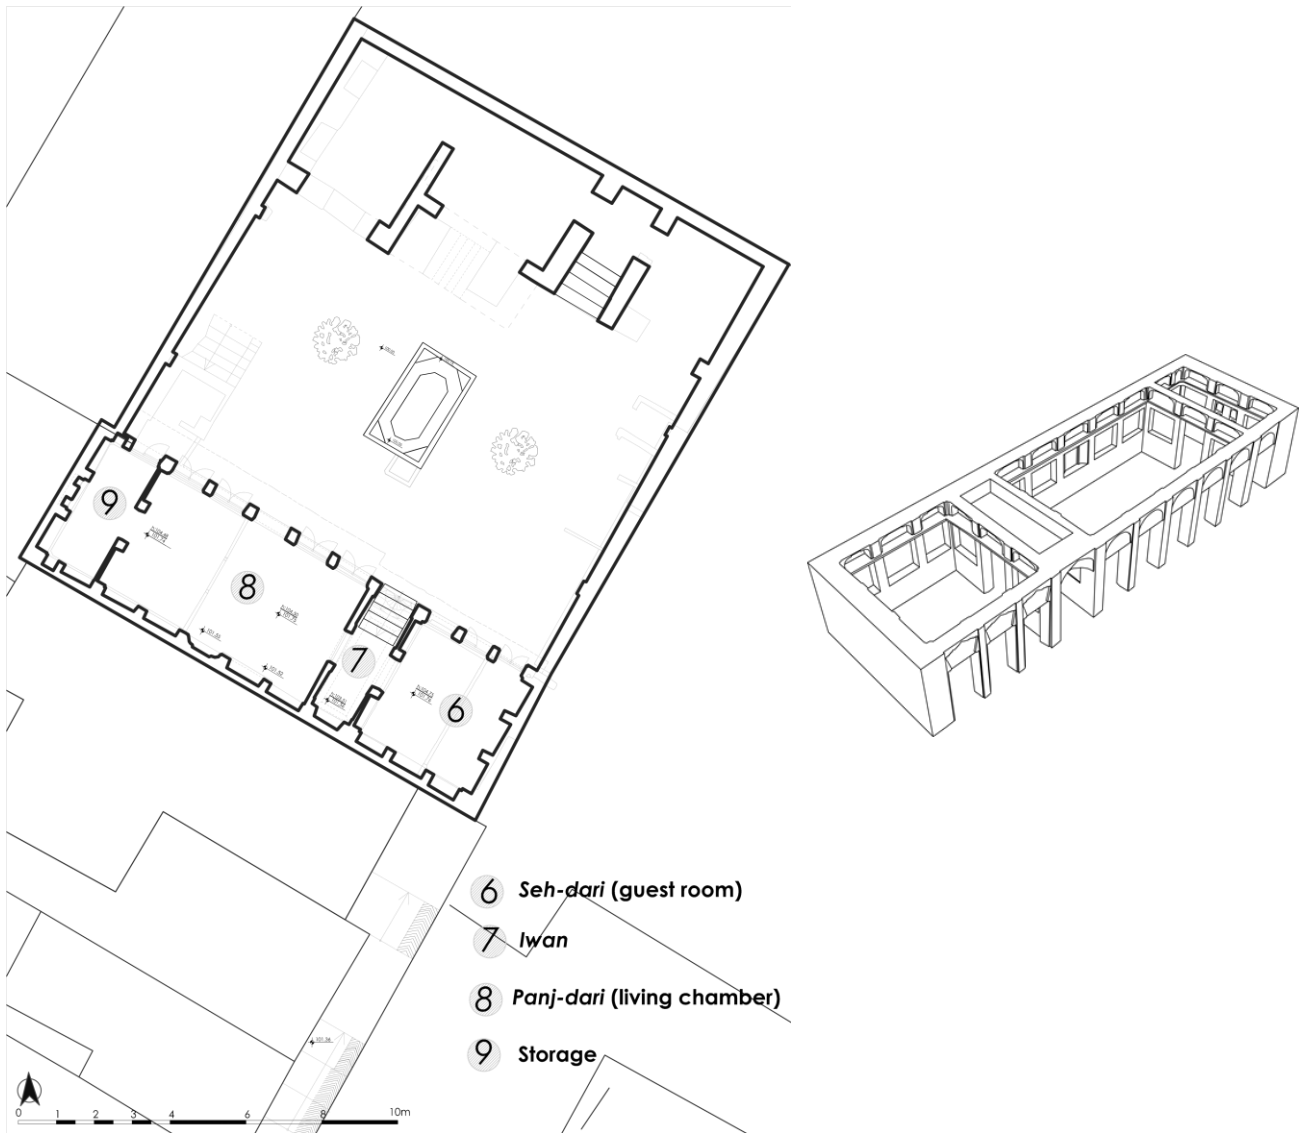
The image depicts the earliest plan of the first floor of south western building mass in which a main chamber, a guest room and an *iwān* are located.
